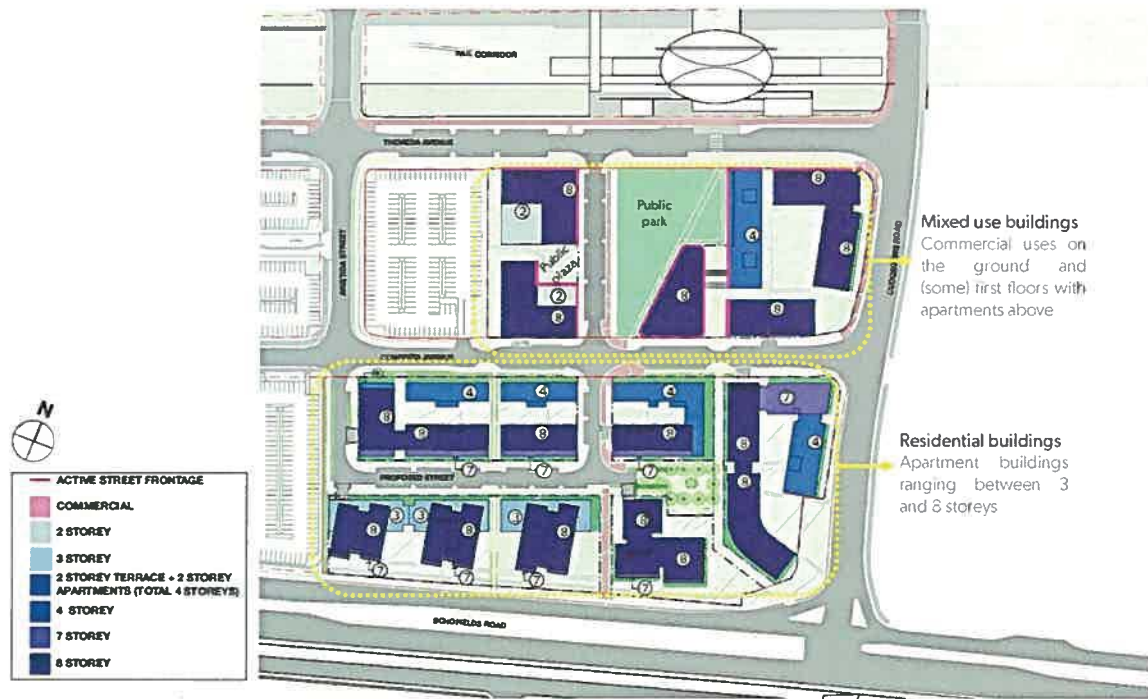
| Indicative land uses and building heights (in storeys). (Source: Applicant's EIS)
